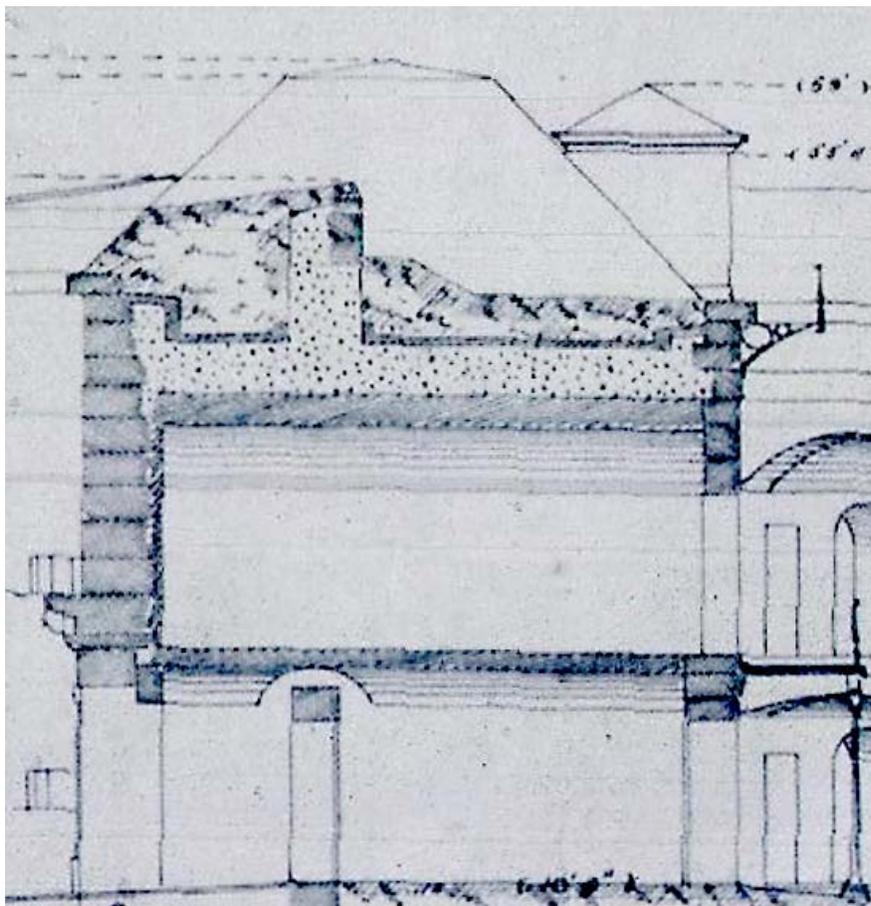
Section of fort walls from original drawings. Note layer of brick and cinder concrete below earthen terreplein.
